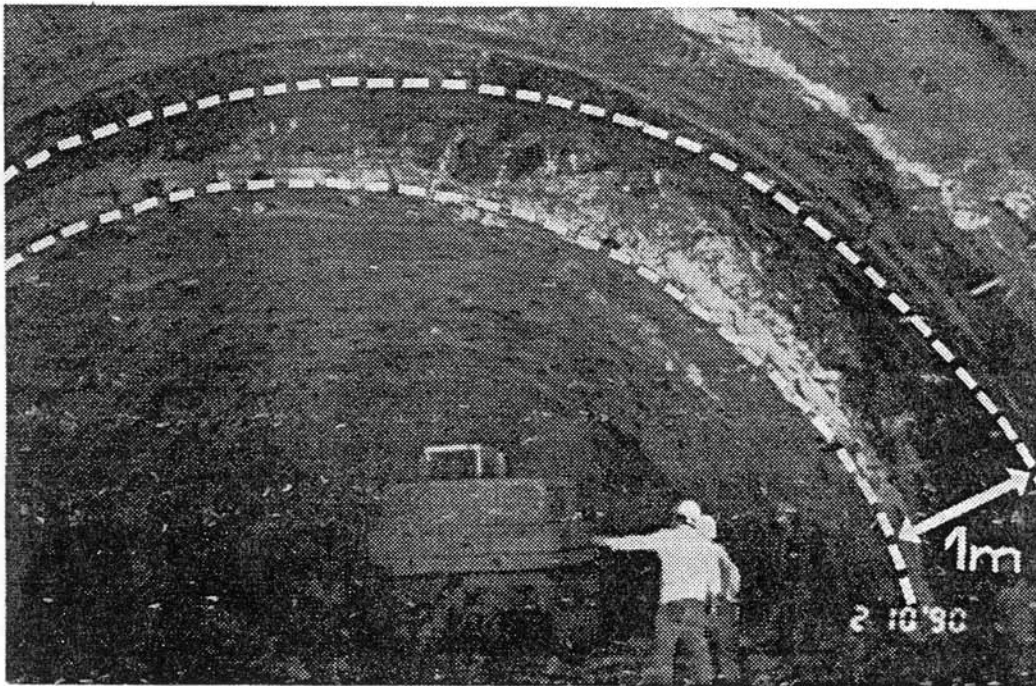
San Vitale Tunnel: phenomena of convergence of the cavity during partial face excavation
